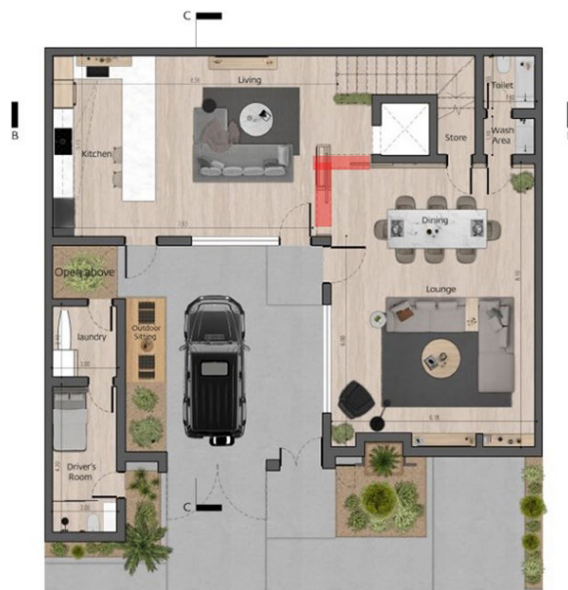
Unit3 (Type D): Ground floor plan (ANOS, n.d.).
